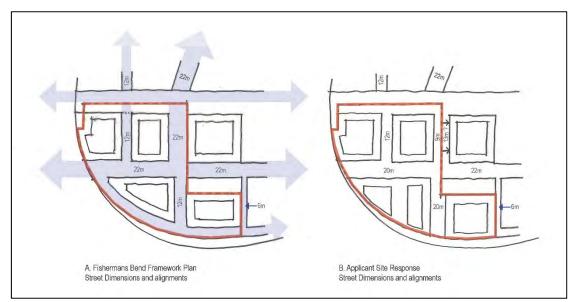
Comparison of Fisherman Bend Framework Plan layout compared to proposed layout
